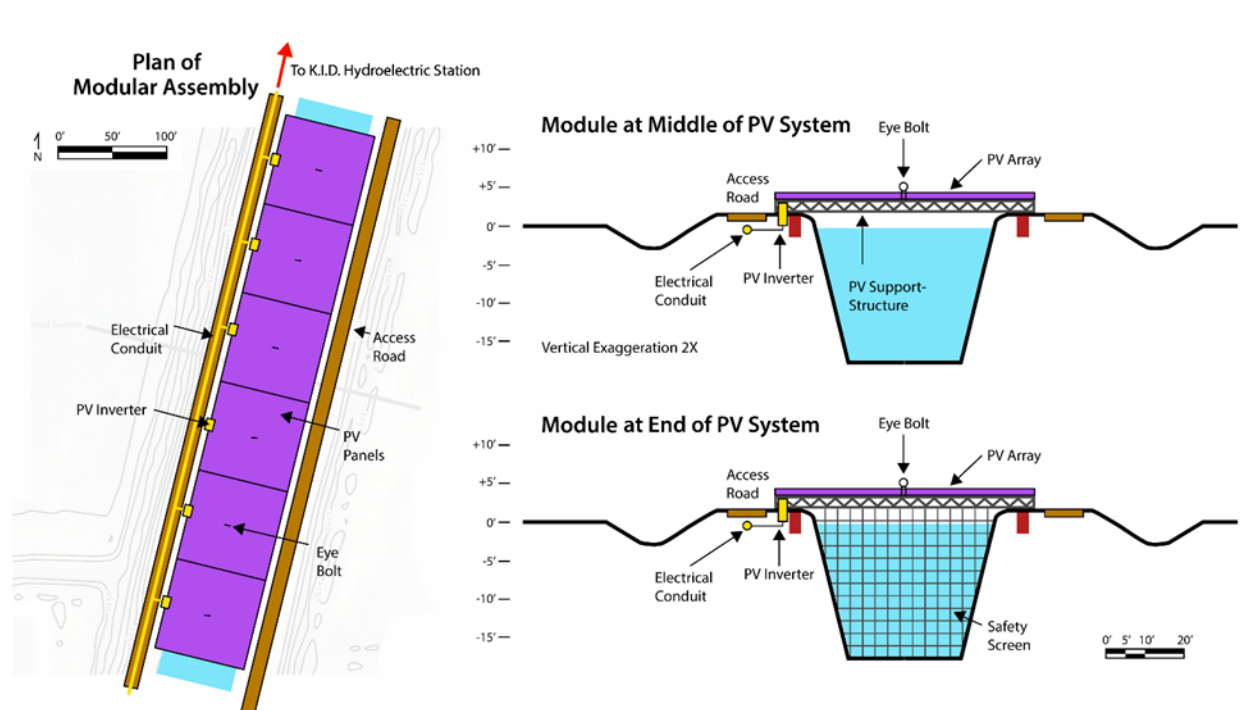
Plan and cross section of typical modules for mounting solar arrays over K.I.D. 'C Canal'.
